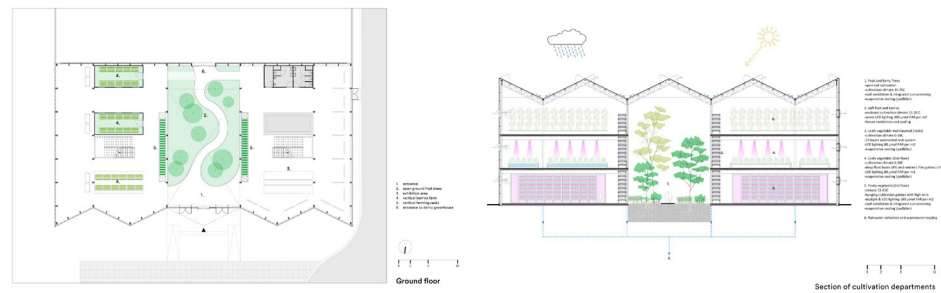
the Vertical Farm Beijing, building ground floor plan and section (Image courtesy of Van Bergen Kolpa Architects).
